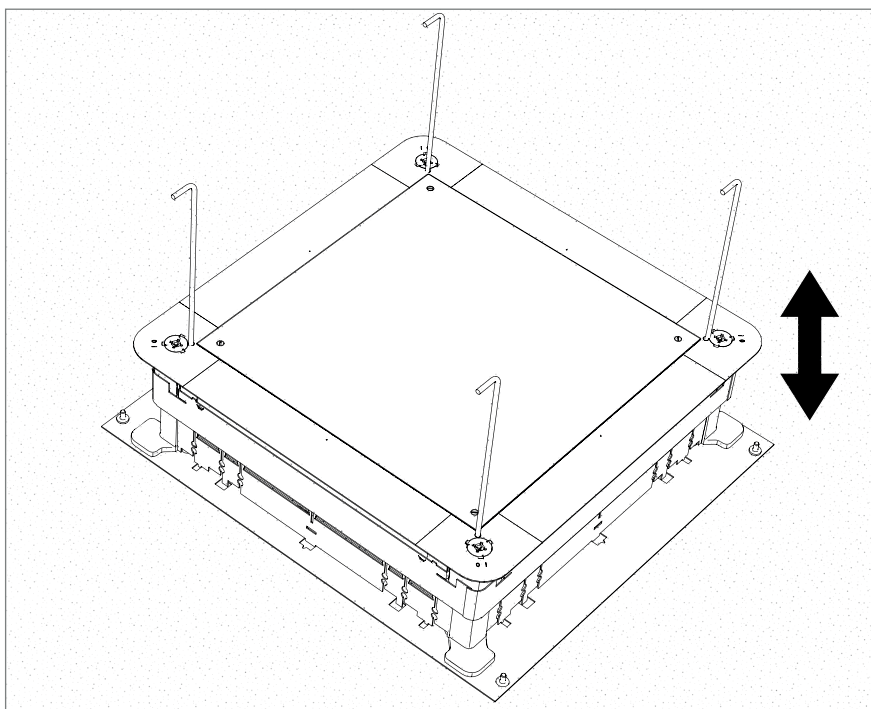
Height adjustment of the underfloor junction boxes/underfloor device sockets
